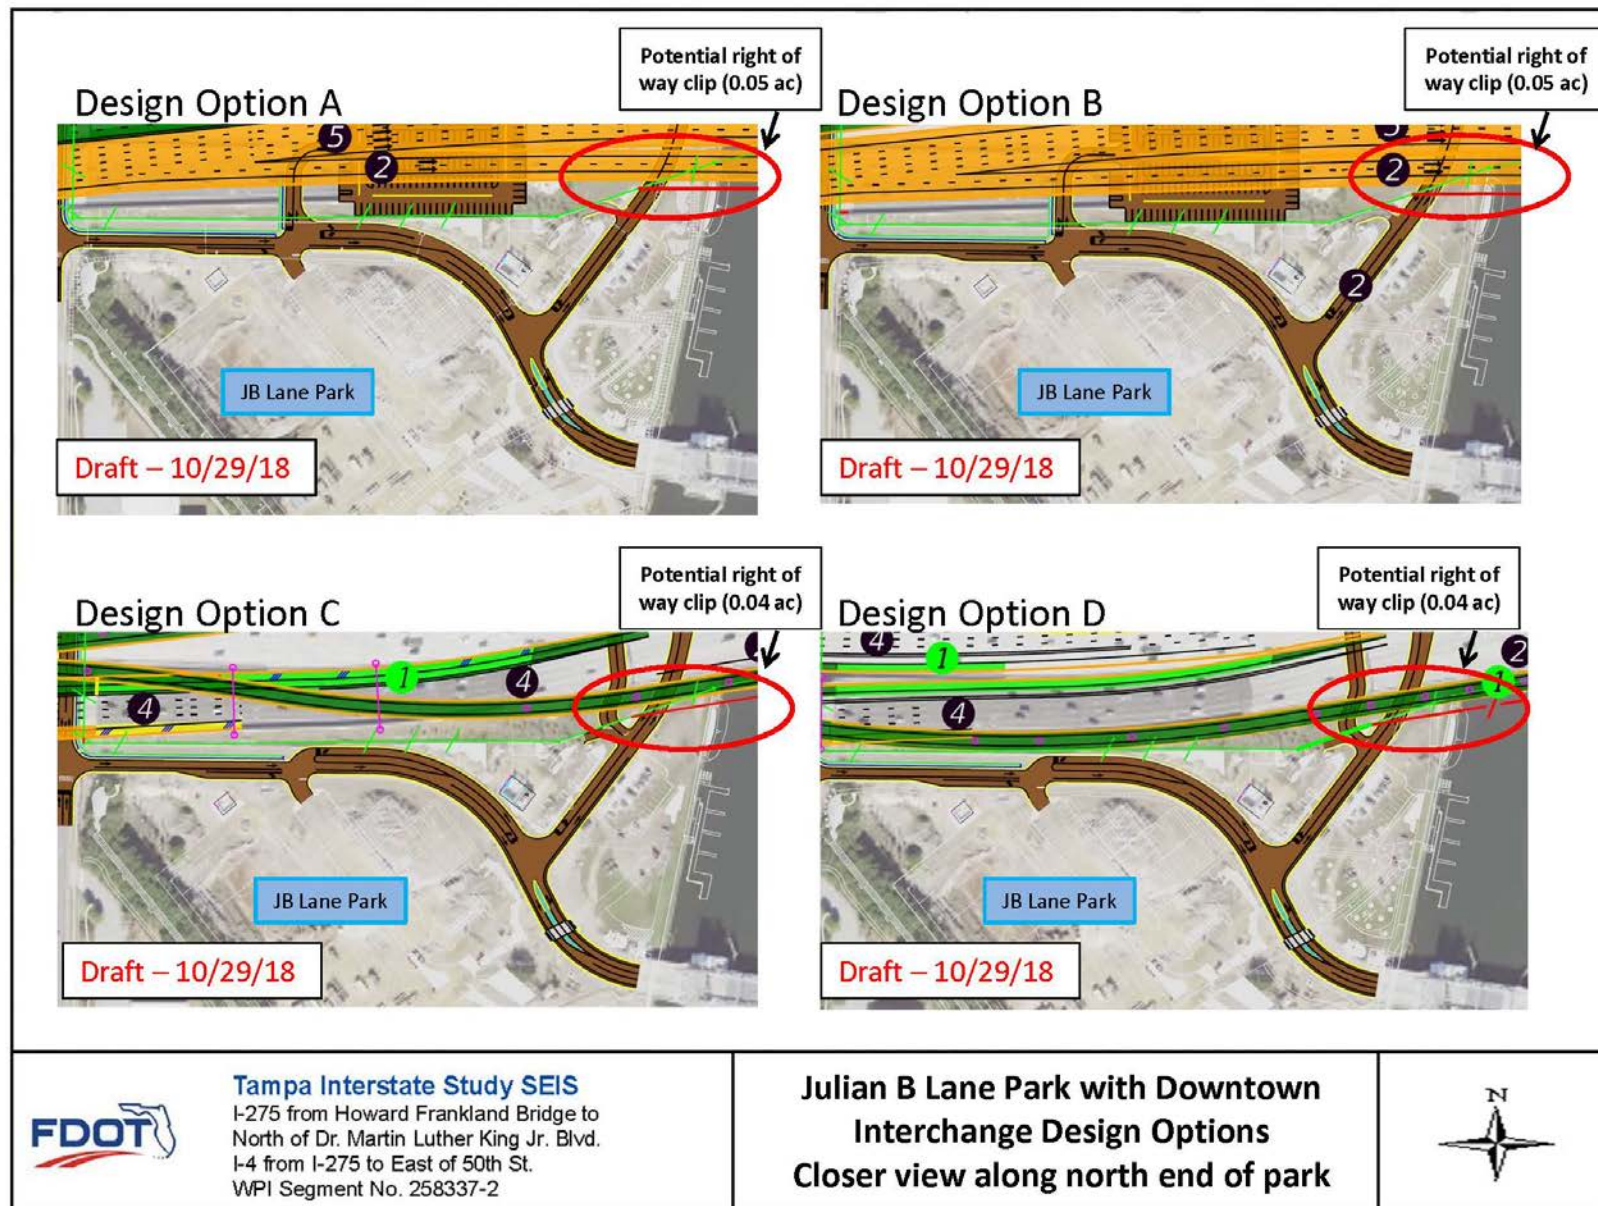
Julian B Lane Riverfront Park – Closer View of Site Layout & Concept Plans
